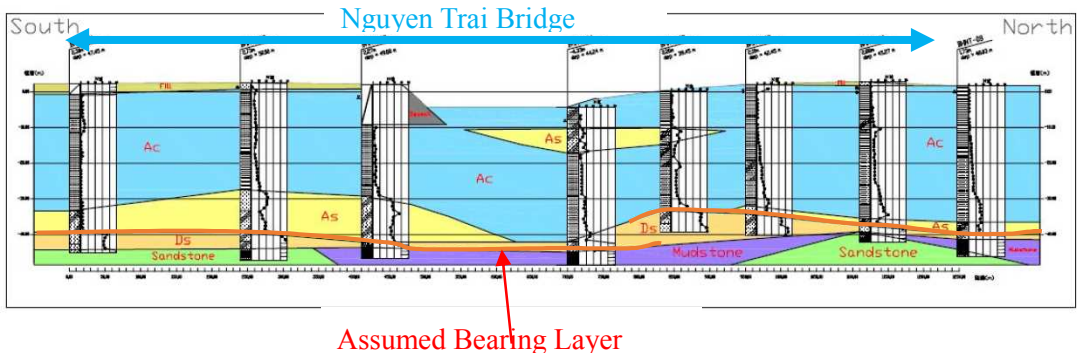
Soil Profile of Nguyen Trai Bridge Location
